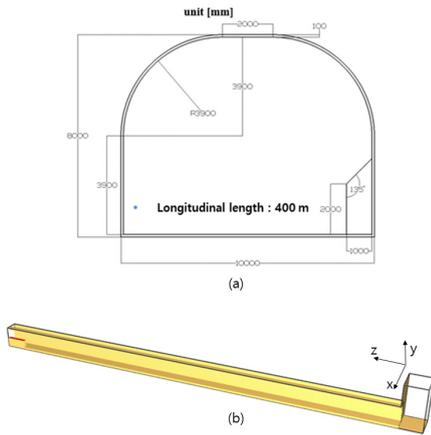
Dimension and modelling of railway tunnel for FDS (a) Cross-section of tunnel, (b) 3D modelling
